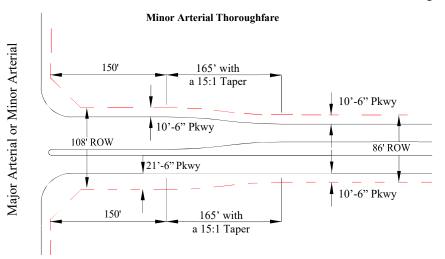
Minor Arterial Thoroughfare Intersection Detail
